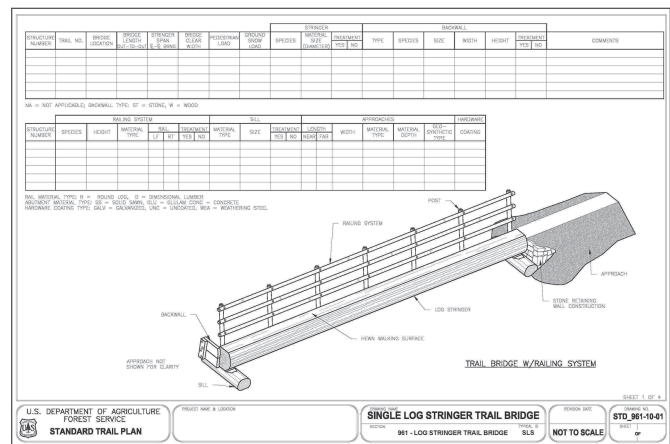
An example of a standard trail bridge drawing from the Forest Service “Standard Trail Bridge Plans” publication.
